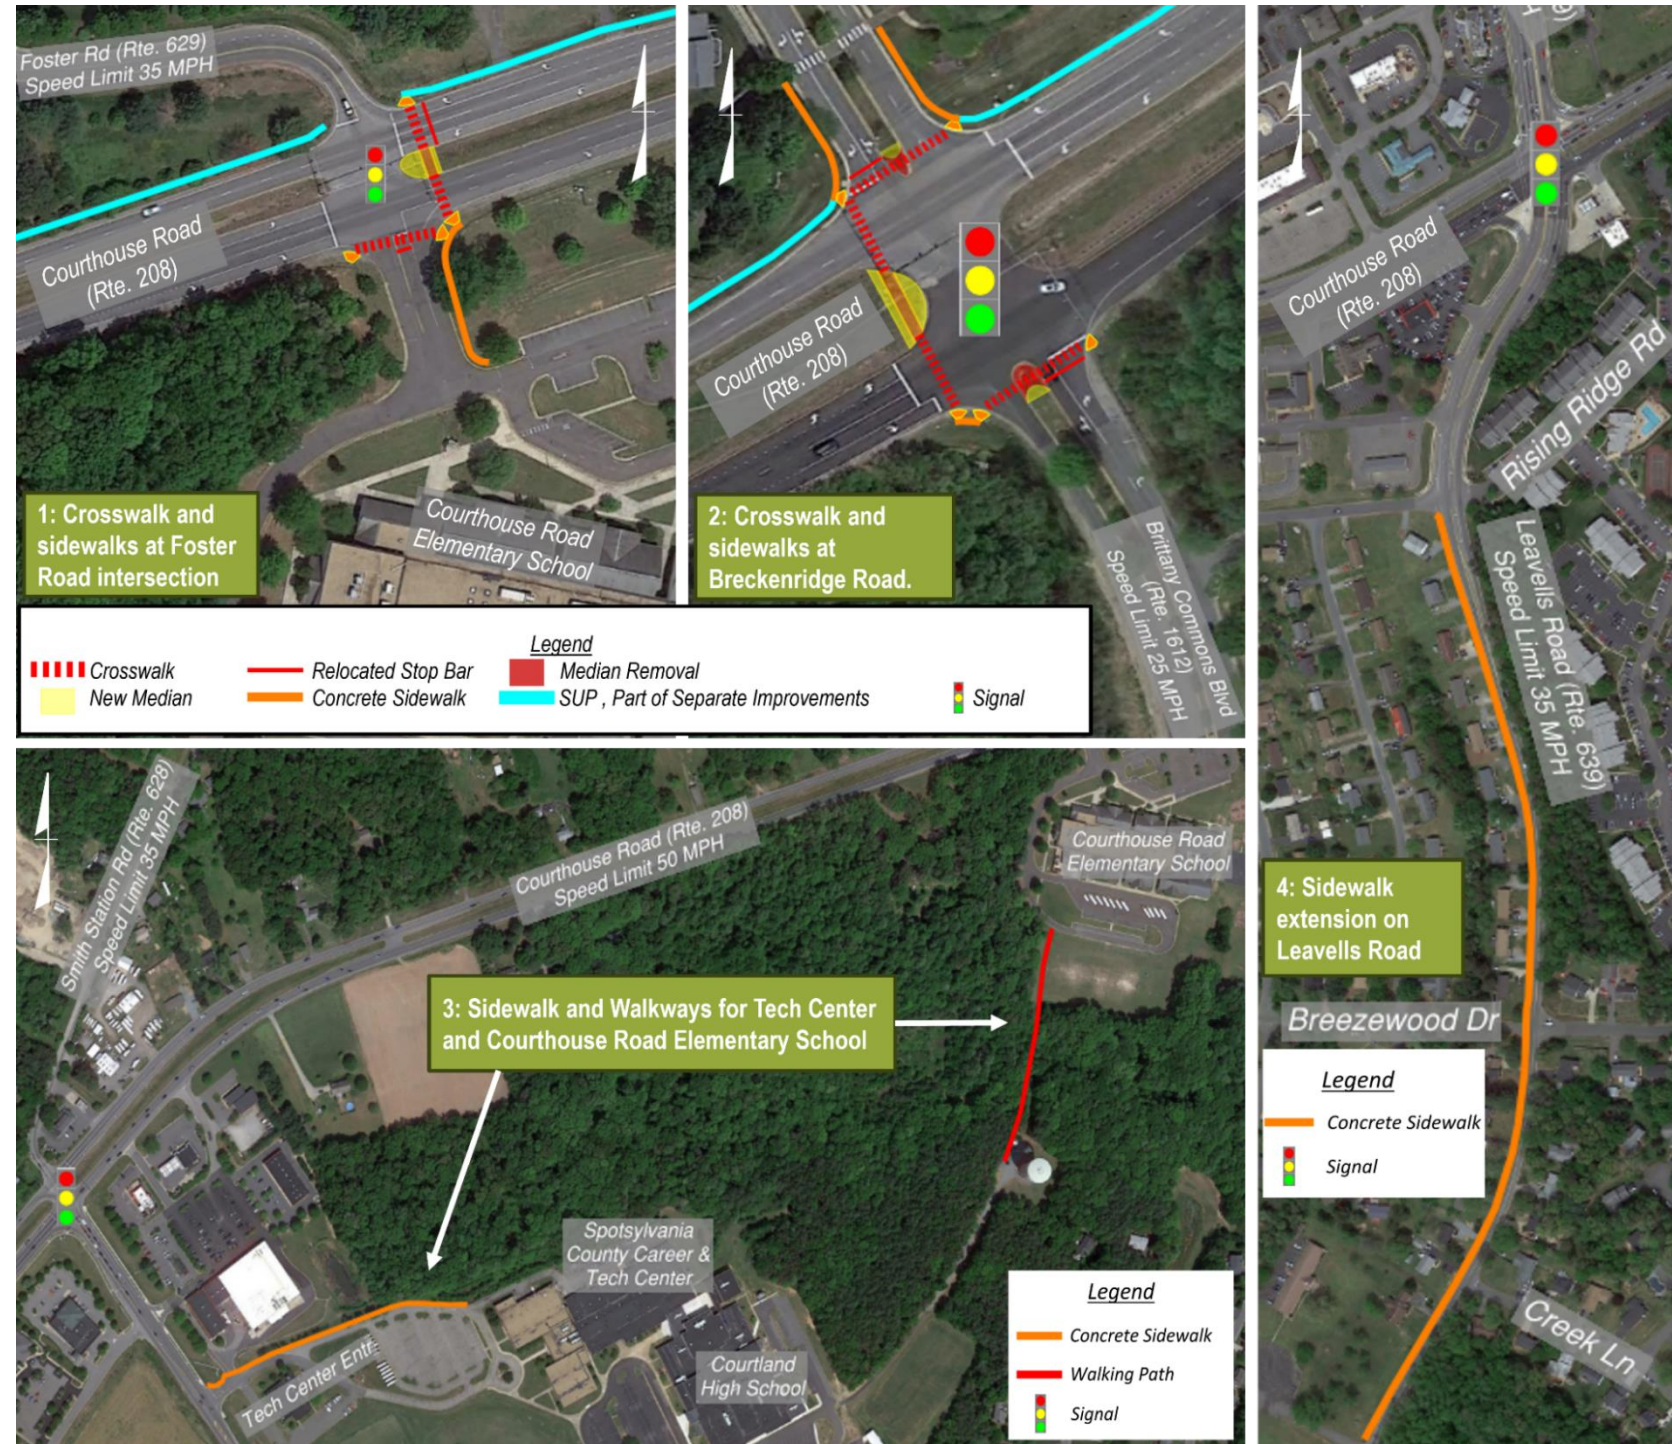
Proposed Crosswalk and Sidewalk Improvements (Other than Shared-Use Path)
